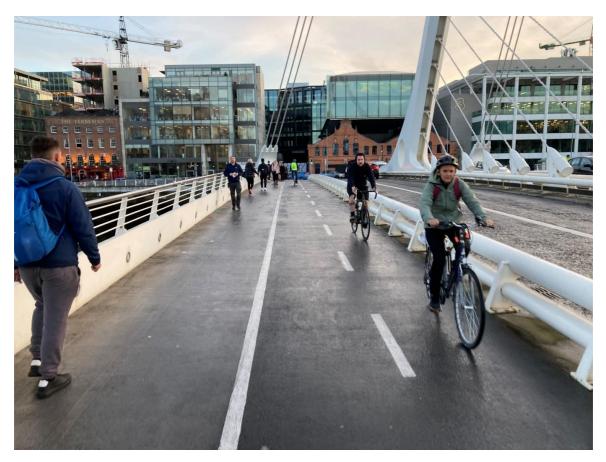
Existing arrangement at of Samuel Beckett Bridge east side
